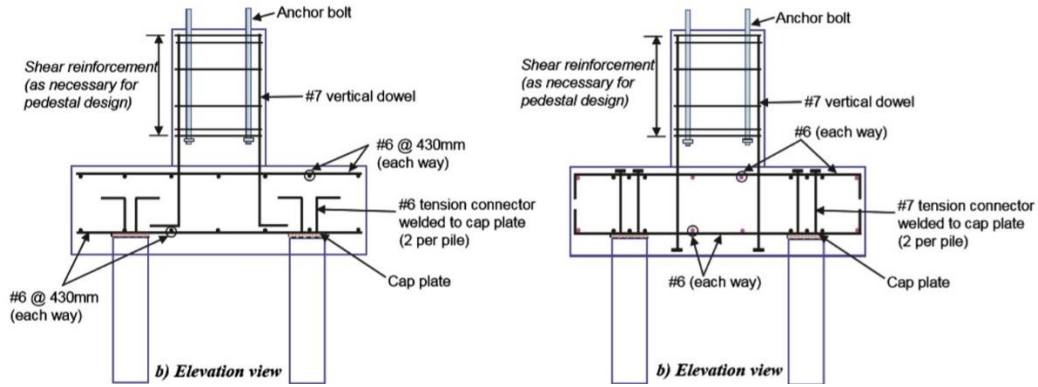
Reinforcement details based on sectional design method (left) and STM (right) (Widiyanto and Bayrak, 2011)
